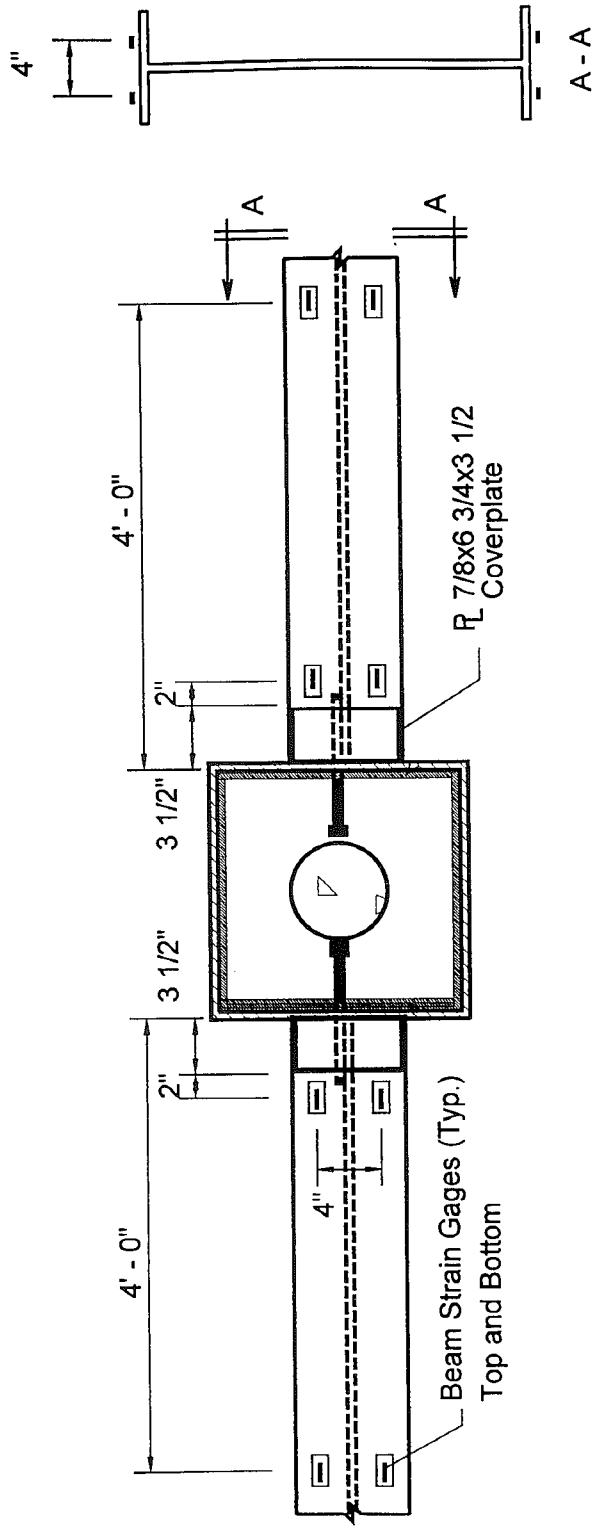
Specimen 1 Beam Strain Gage Instrumentation
